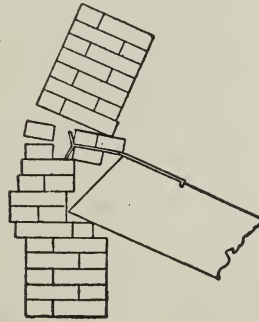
Destructive Effect of Anchor at Top of Joist.
